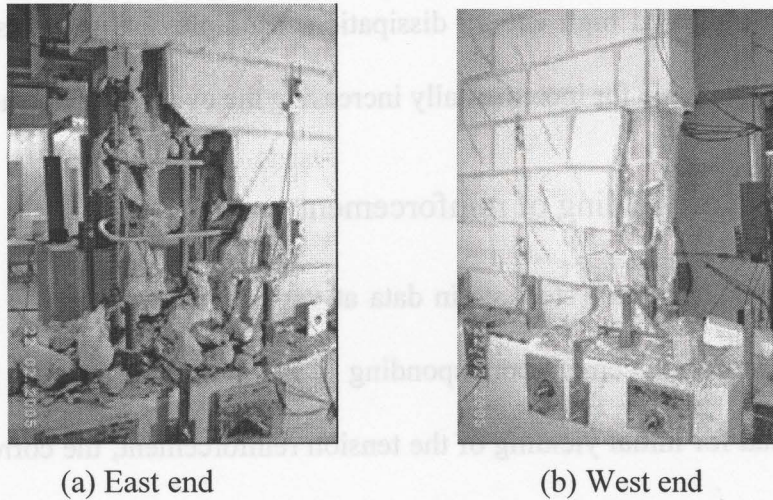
20: Damage of Wall 2 at the end of the test at 60 mm top deflection
